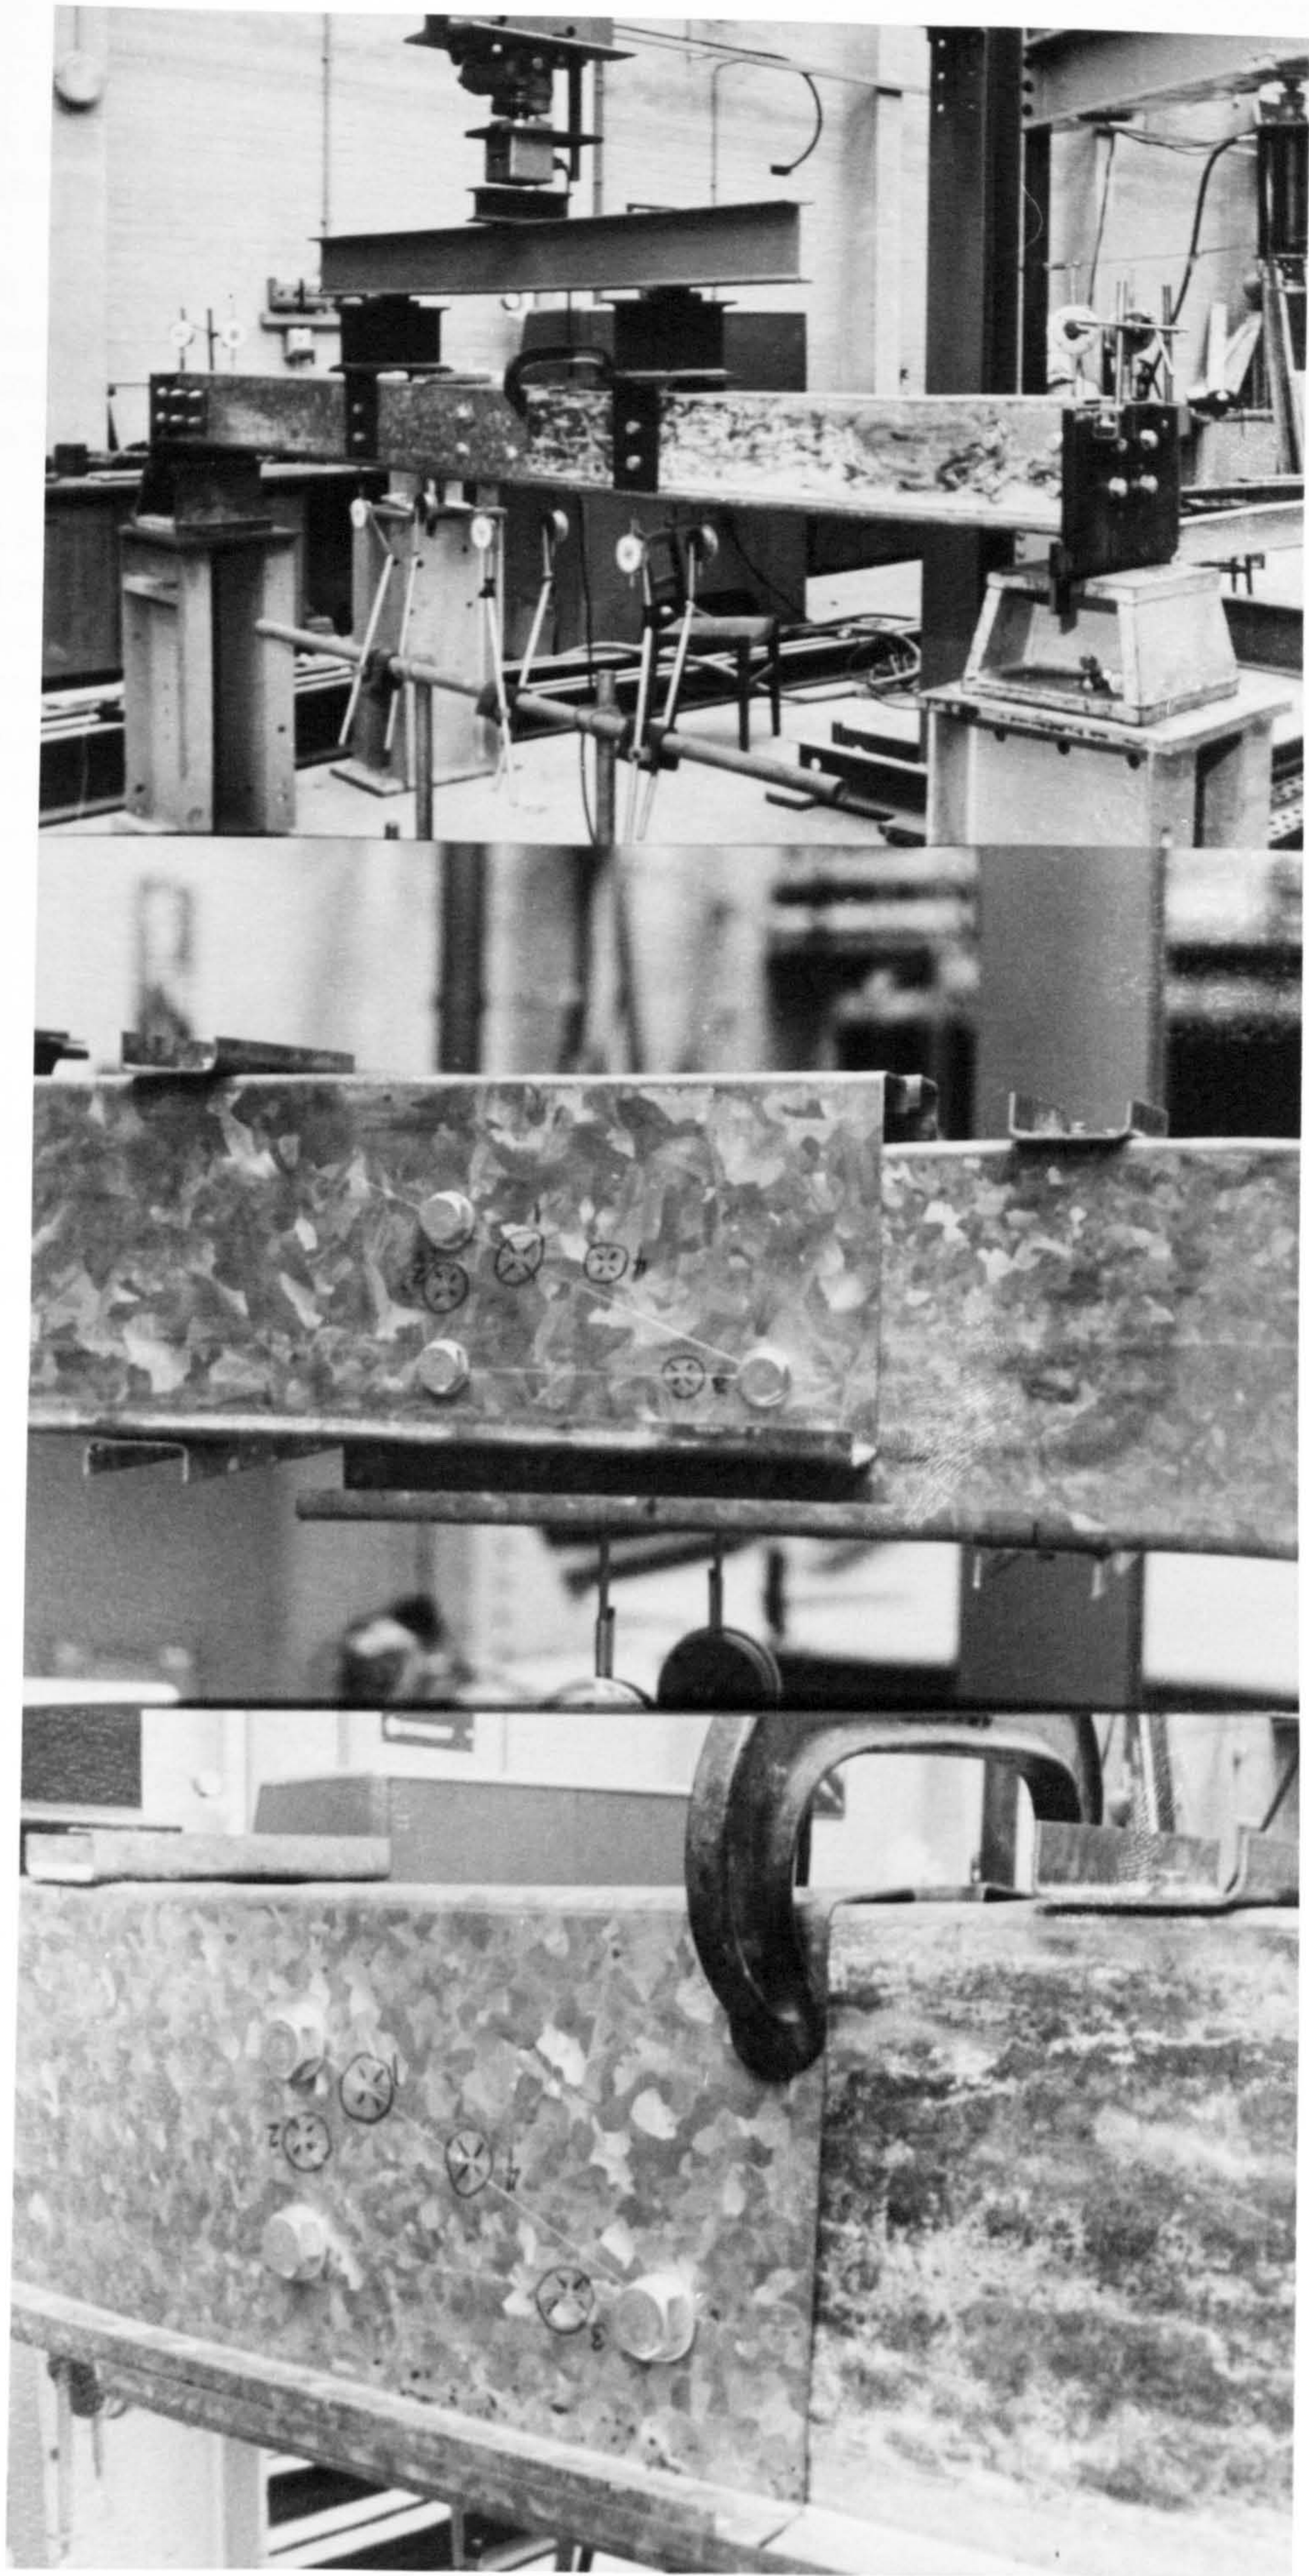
Zed sections shown in general test arrangement, staggered and nesting respectively.
